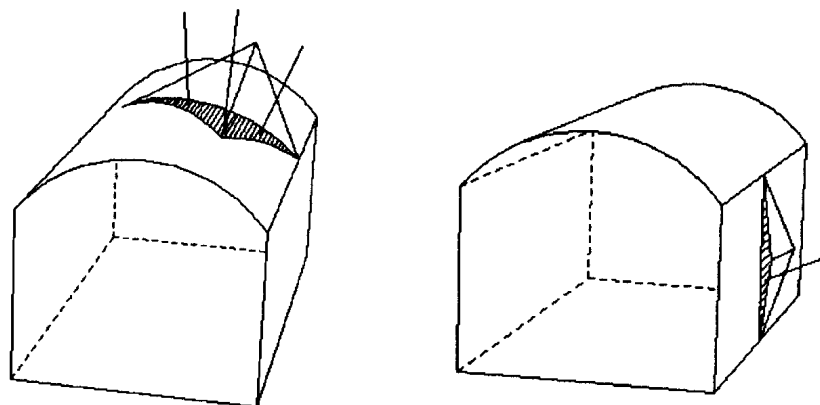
Rock bolting design for the roof wedge and one of the sidewall wedges in the tunnel example discussed earlier.
